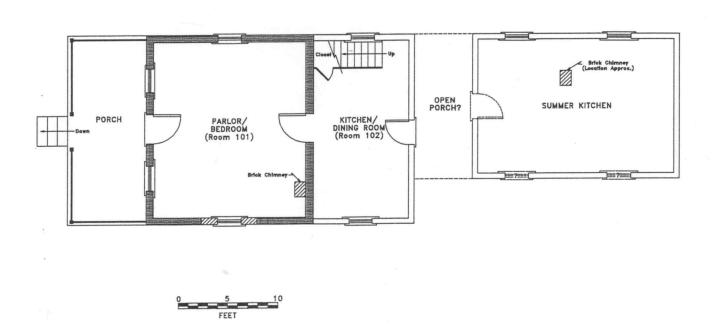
Ground floor plan of the Allard House, after construction of the brick-nogged addition and summer kitchen (ca. 1850-60).
